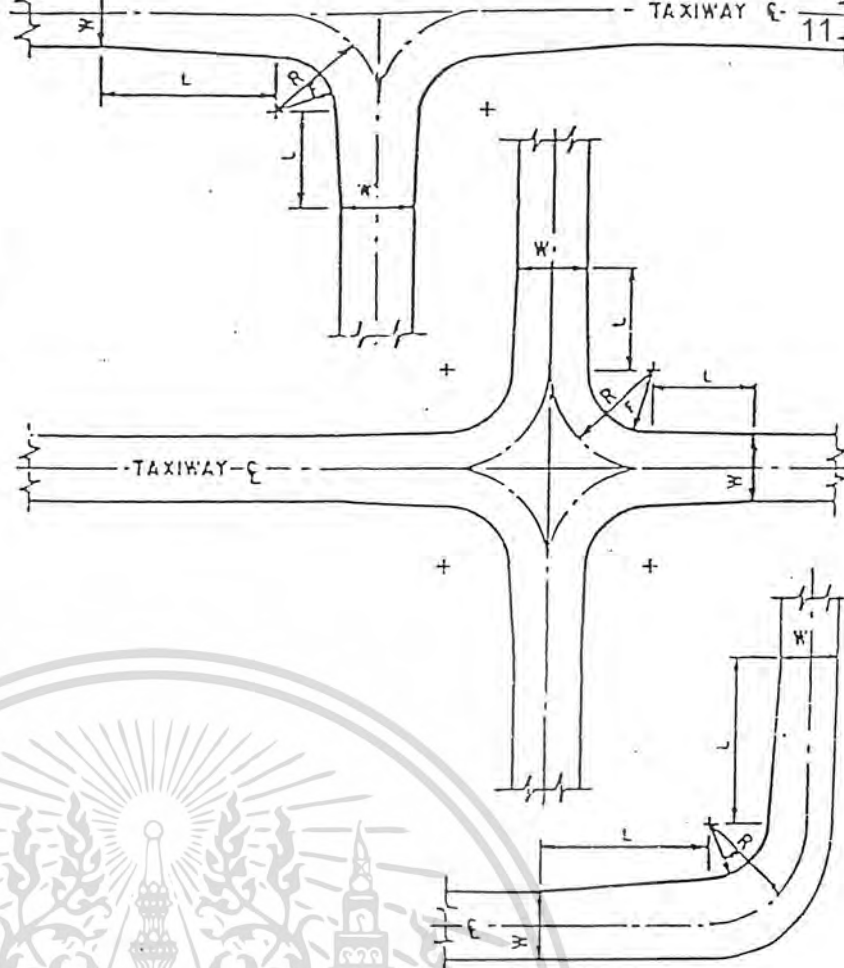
Typical taxiway intersection details. (Source: Reference 5.)
